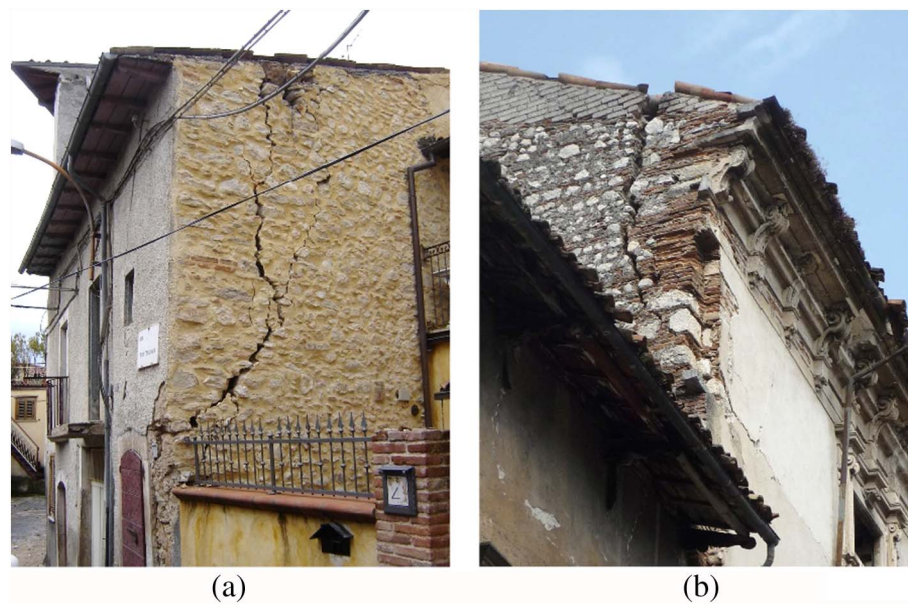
Out-of-plane mechanism of (a) a whole and (b) the upper part of masonry buildings walls.
